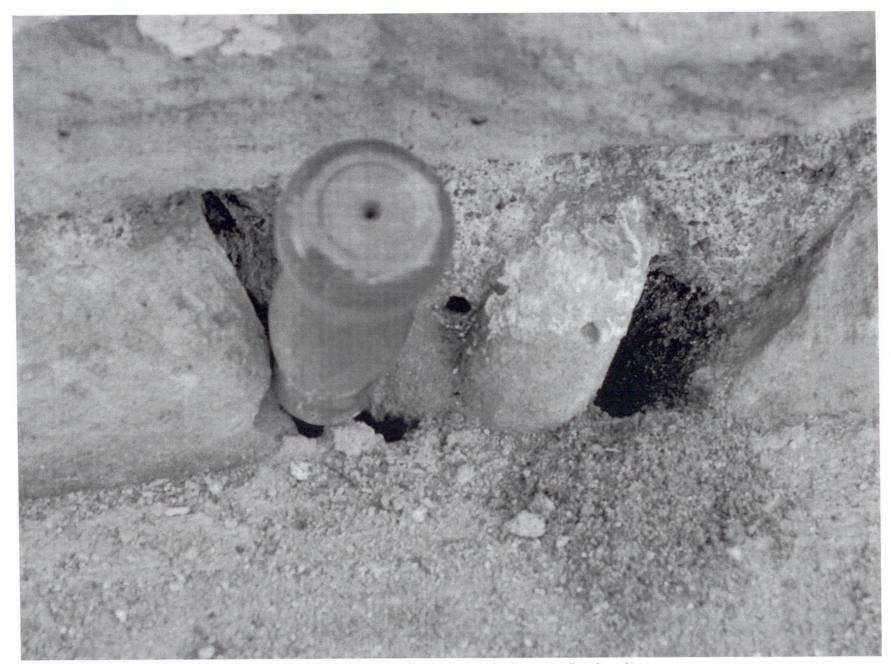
Water penetration of foundation from sidewalk; erosion of lime mortar; no expansion joint; hard concrete adhered to soft stone
